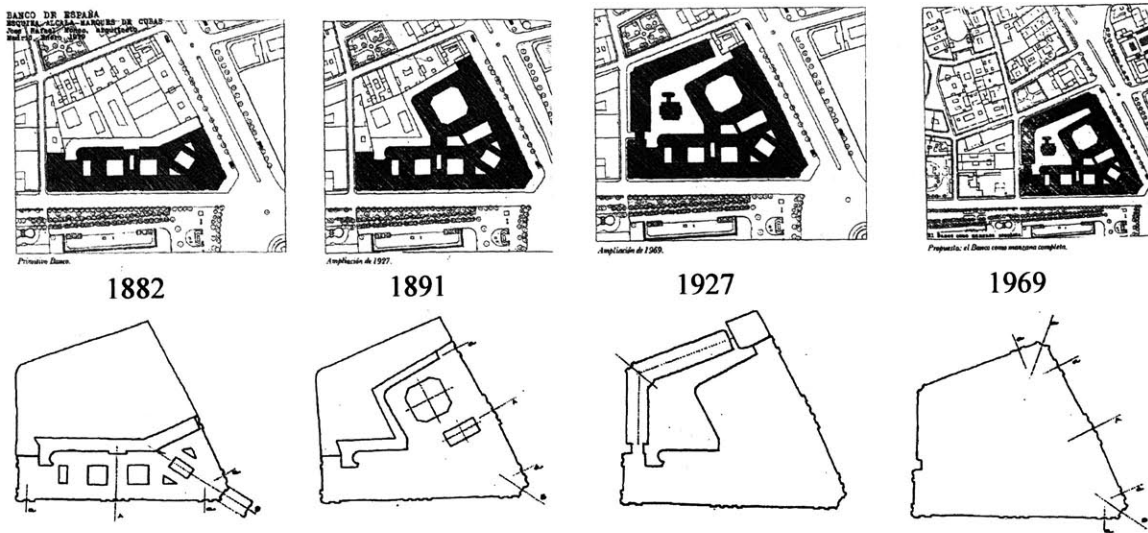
Rafael Moneo. Banco de España, site plan analysis
